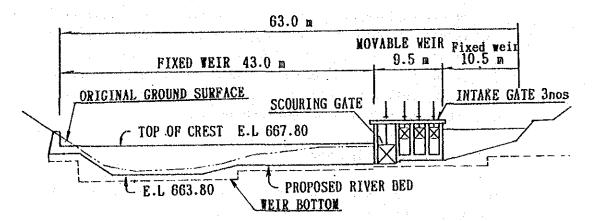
Schematic Cross Section of Proposed Diversion Works
